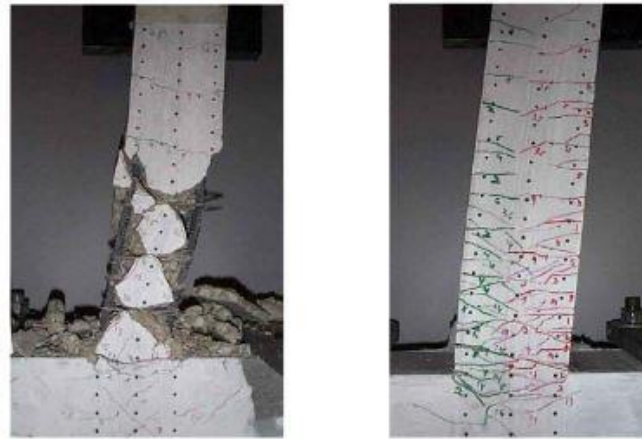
Damage behaviour of reinforced concrete column with stirrups (left) and reinforced ECC column (right) (Li, 2003)
